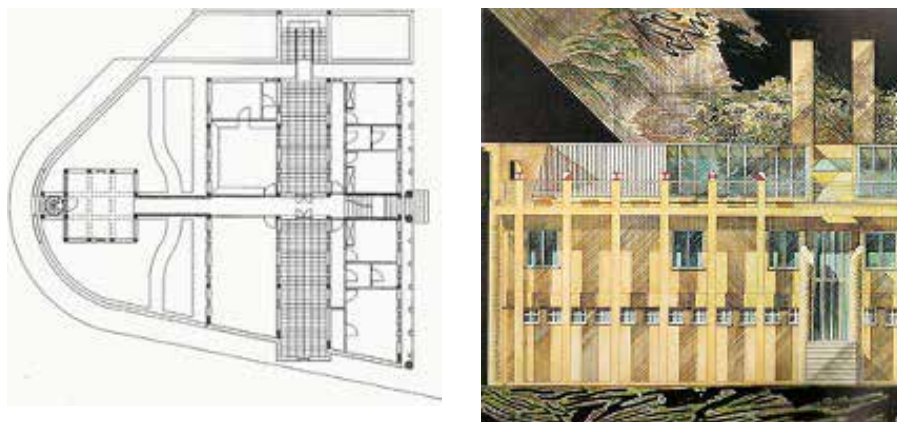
Franco Purini and Laura Thermes, 'Casa del Farmacista' [Pharmacist's House], Gibellina (1980-1983). Plan and façade detail.
